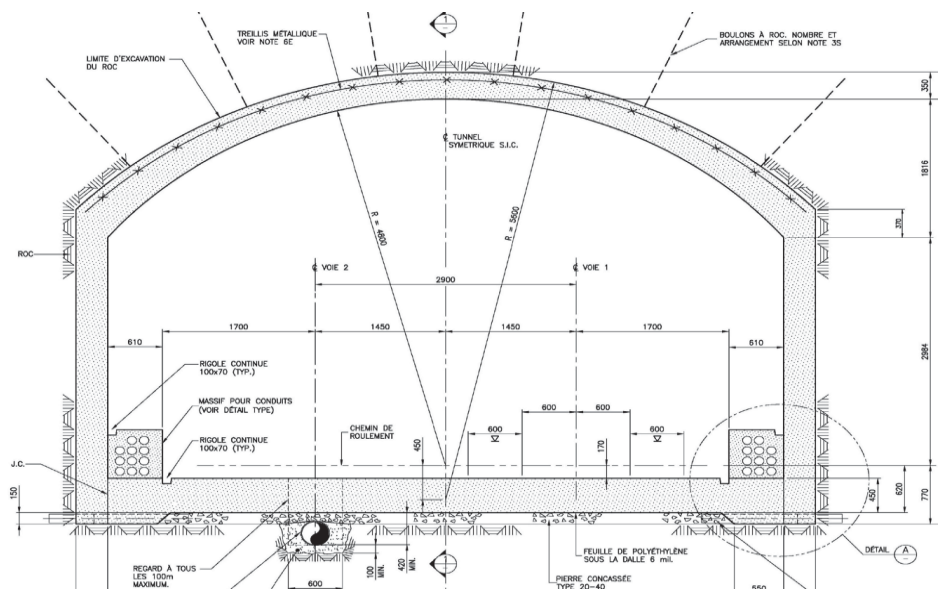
Montreal metro extension cross section (SNC-Lavalin, 2010)
